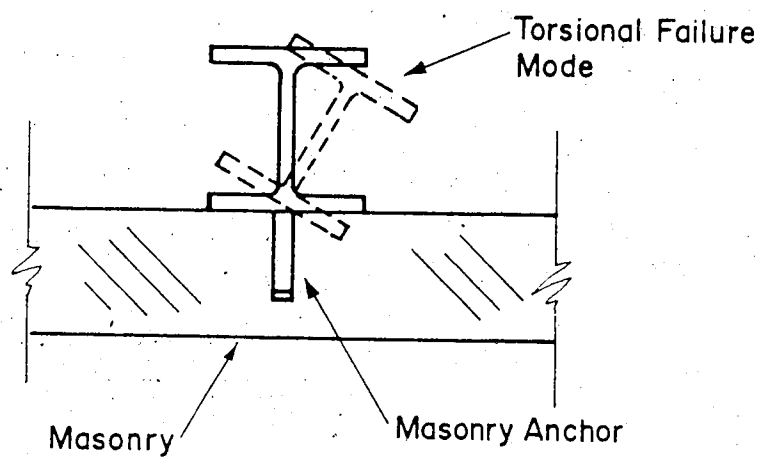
COLUMNS BRACED ABOUT THEIR OUTSIDE FLANGES BY MASONRY
